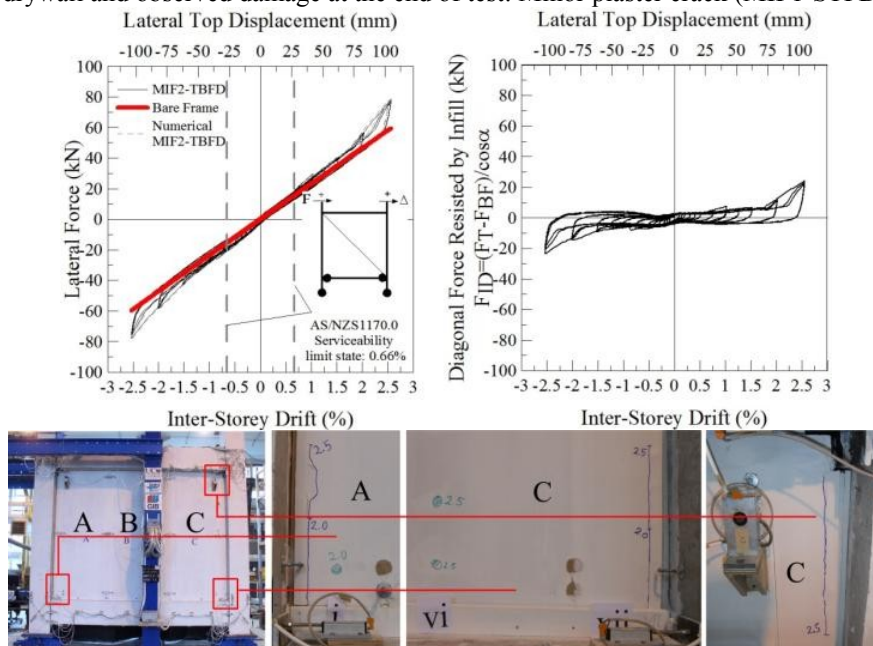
Hysteresis curve and corresponding diagonal force acting on the drywall for low damage timber framed drywall and observed damage at the end of test: Minor plaster crack (MIF2-TBFD)
